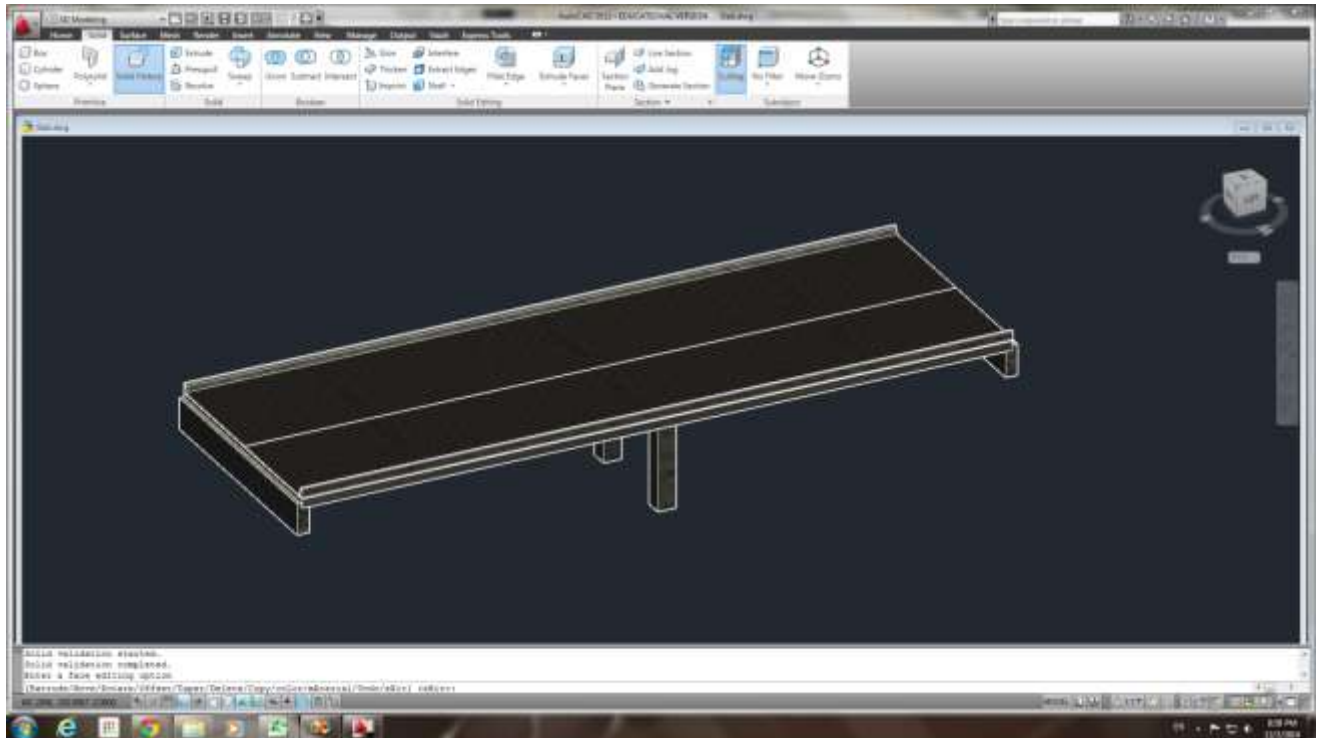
21 Viewing the 3D Drawing within the AutoCAD Platform
